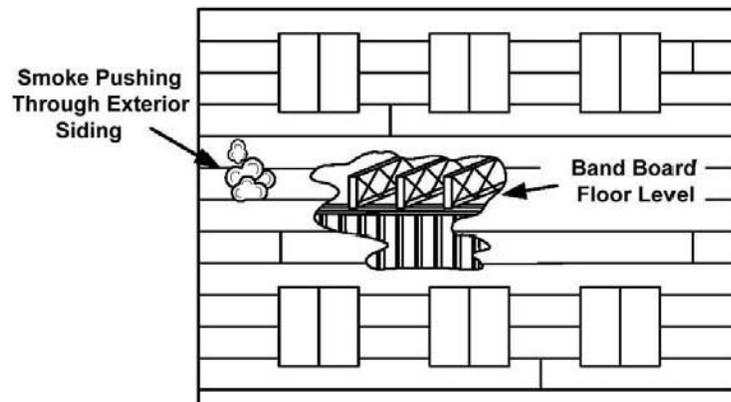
Smoke issuing from the band board area can indicate fire has breached the truss floor space.
